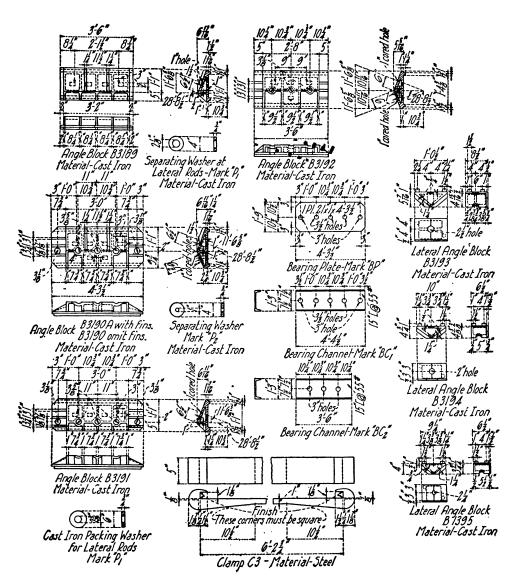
IRON DETAILS FOR 150 FT. SPAN, HOWE TRUSS SPAN. C. M. & P. S. RY.
